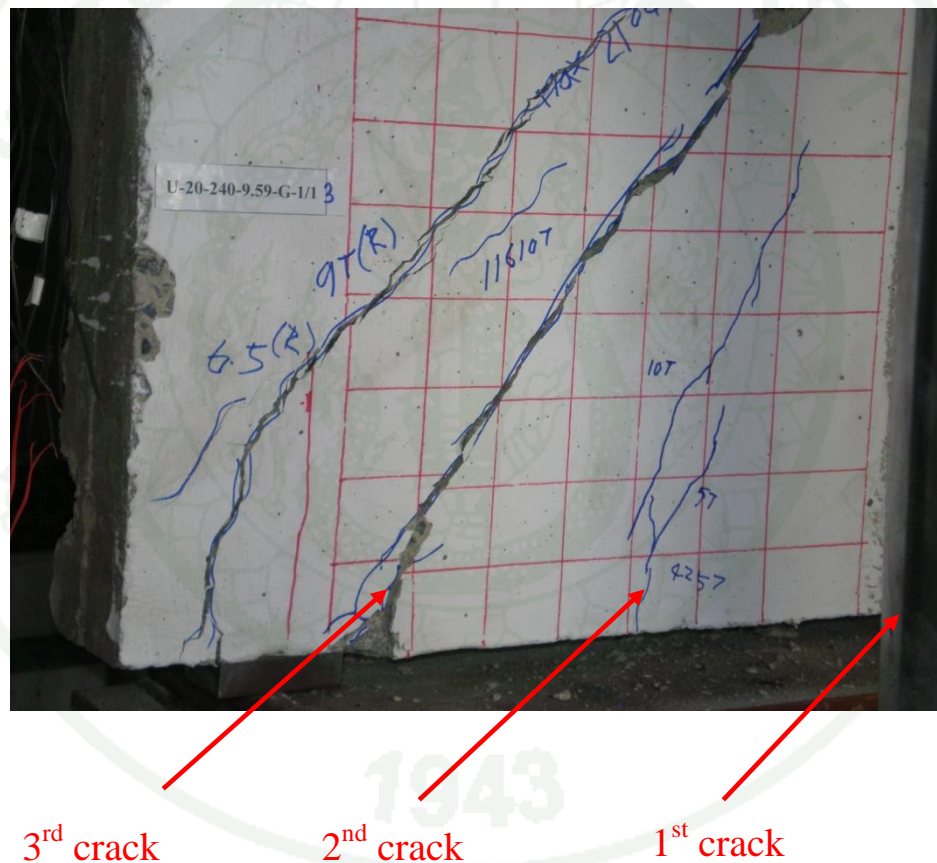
Cracking development of specimen Griptec large head dia 20 mm U-20-240-9.59-G-1/1
